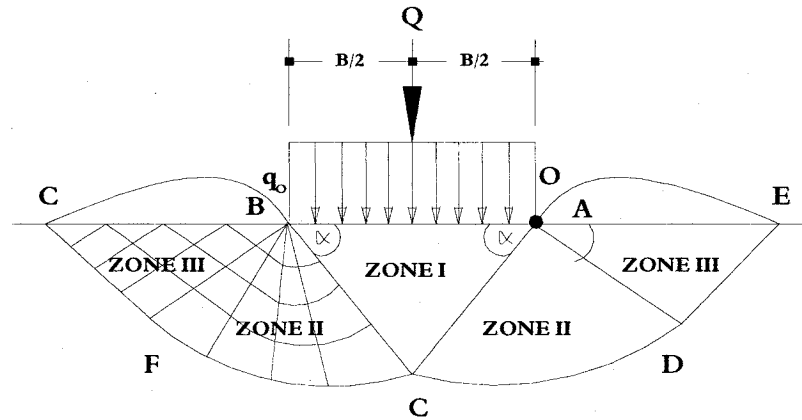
Bearing capacity failure in soil under a rough rigid continuous foundation (modified after Terzaghi 1943)
